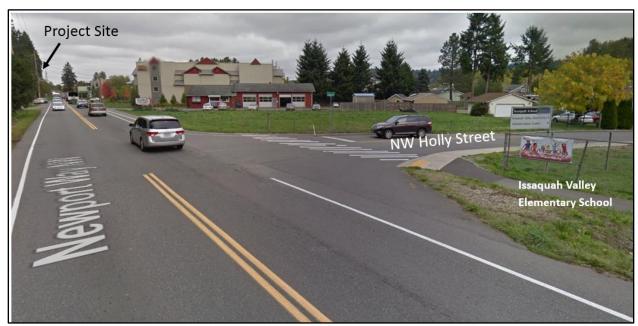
Existing conditions at intersection of Newport Way NW and NW Holly Street
